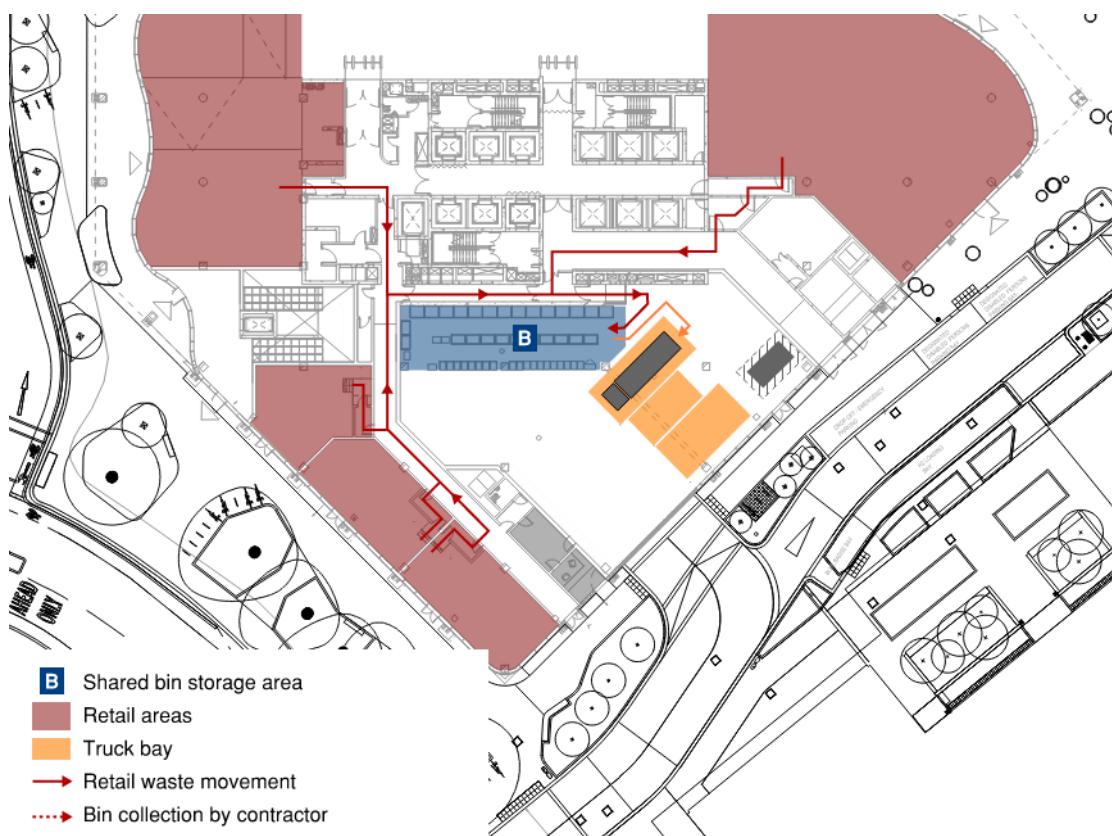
Ground floor back-of-house areas showing the retail centralised bin stores and waste movement routes
